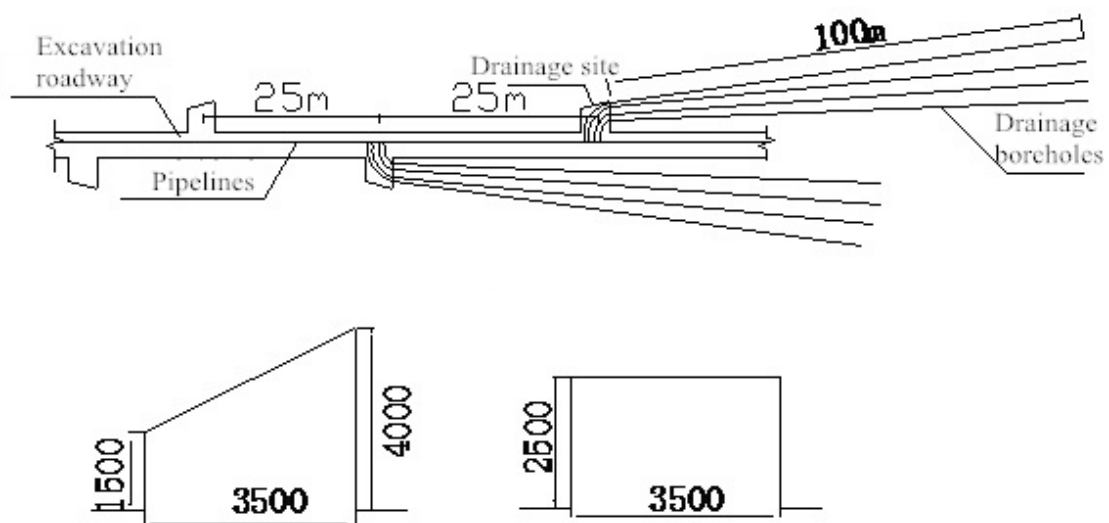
Excavating while drainage in the working face of excavating tunnel
